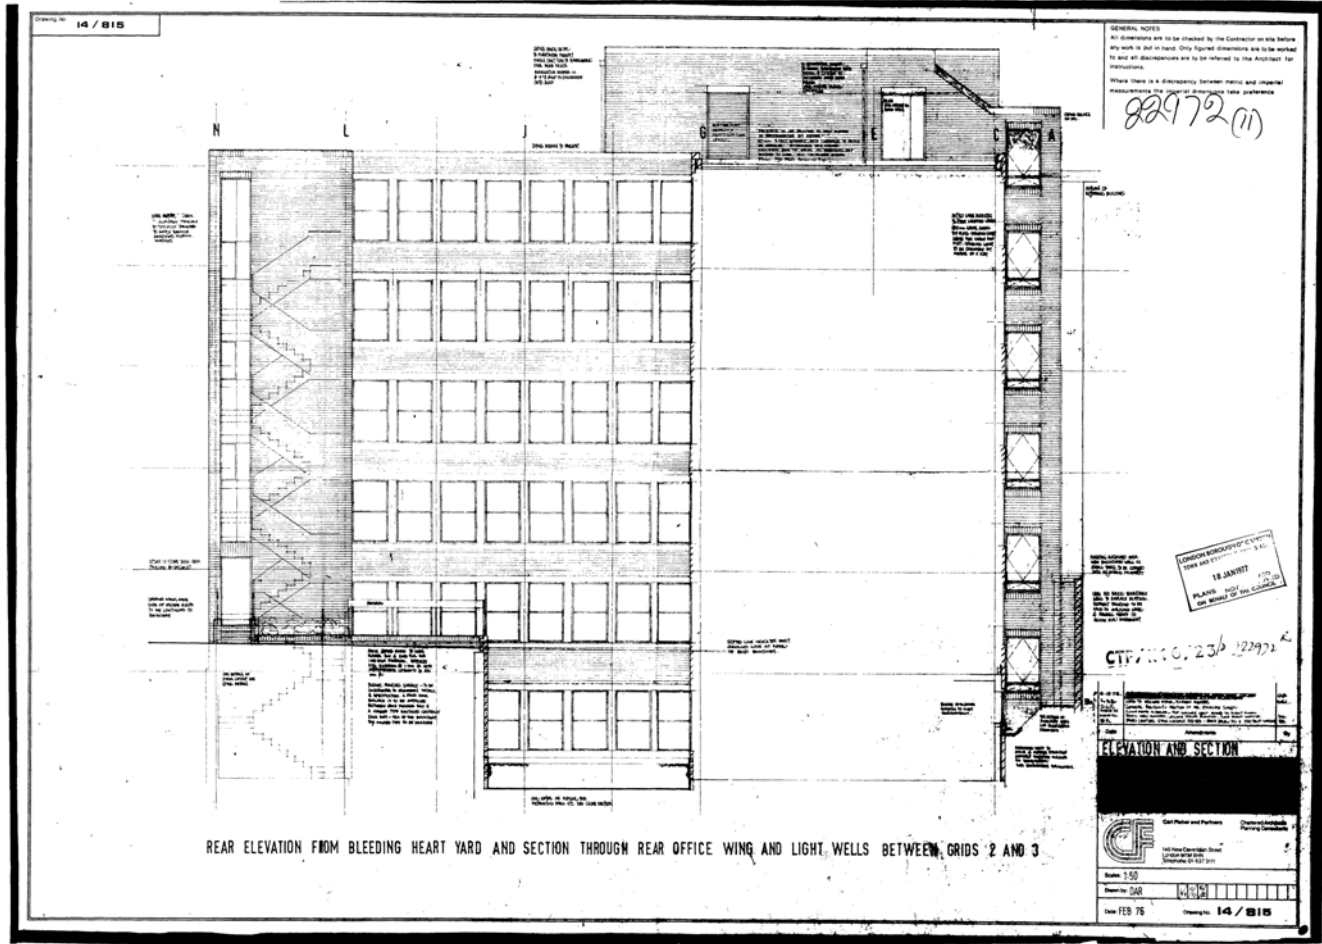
Carl Fisher and Partners, South Elevation, 1976.
